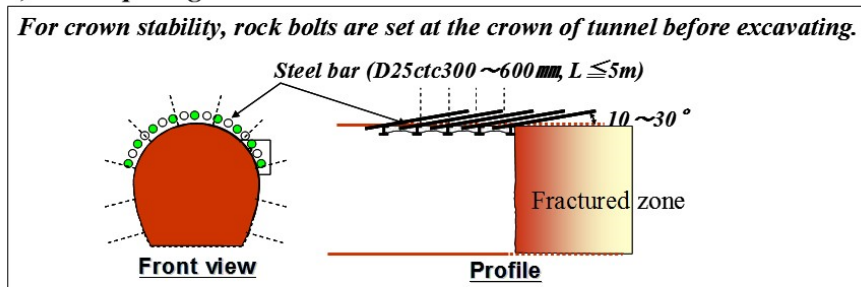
Support System Used in Tunneling Work (Source: USACE, 1997)
